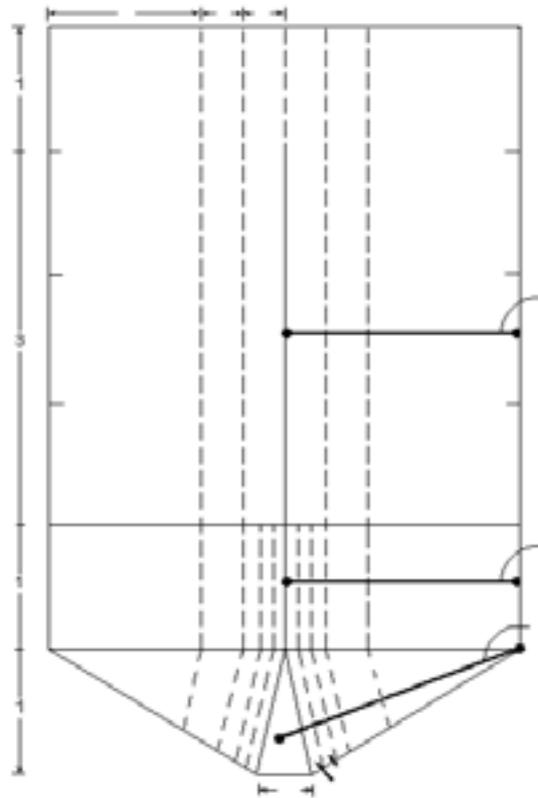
Plan View Showing the Dimensions of ERB2B.
